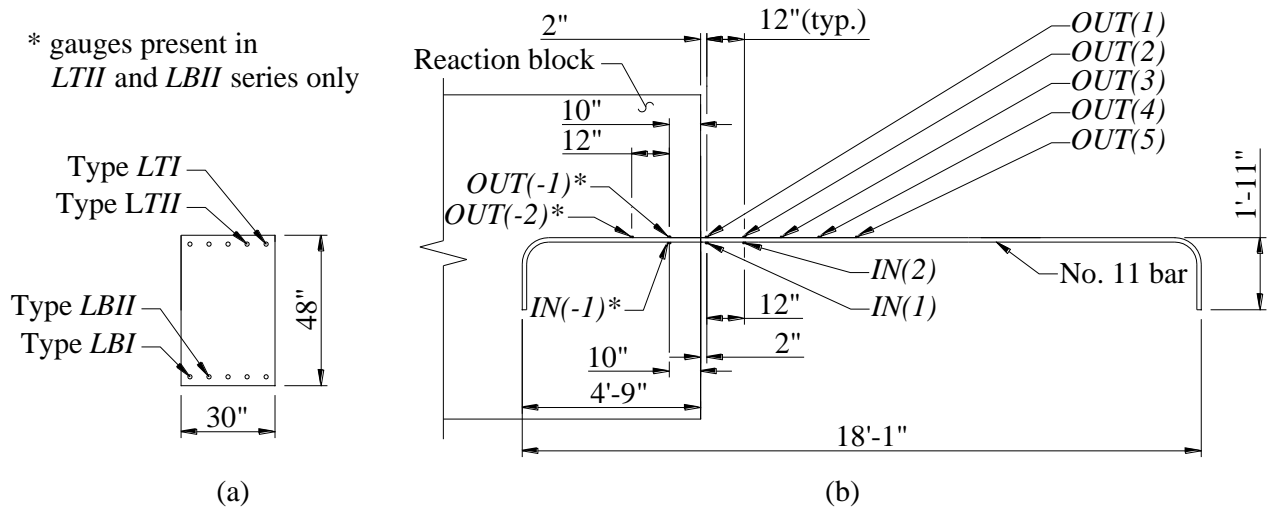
Layout of longitudinal reinforcement strain gauges: (a) location of instrumented bars; (b) location of strain gauges along a single No. 11 bar.
